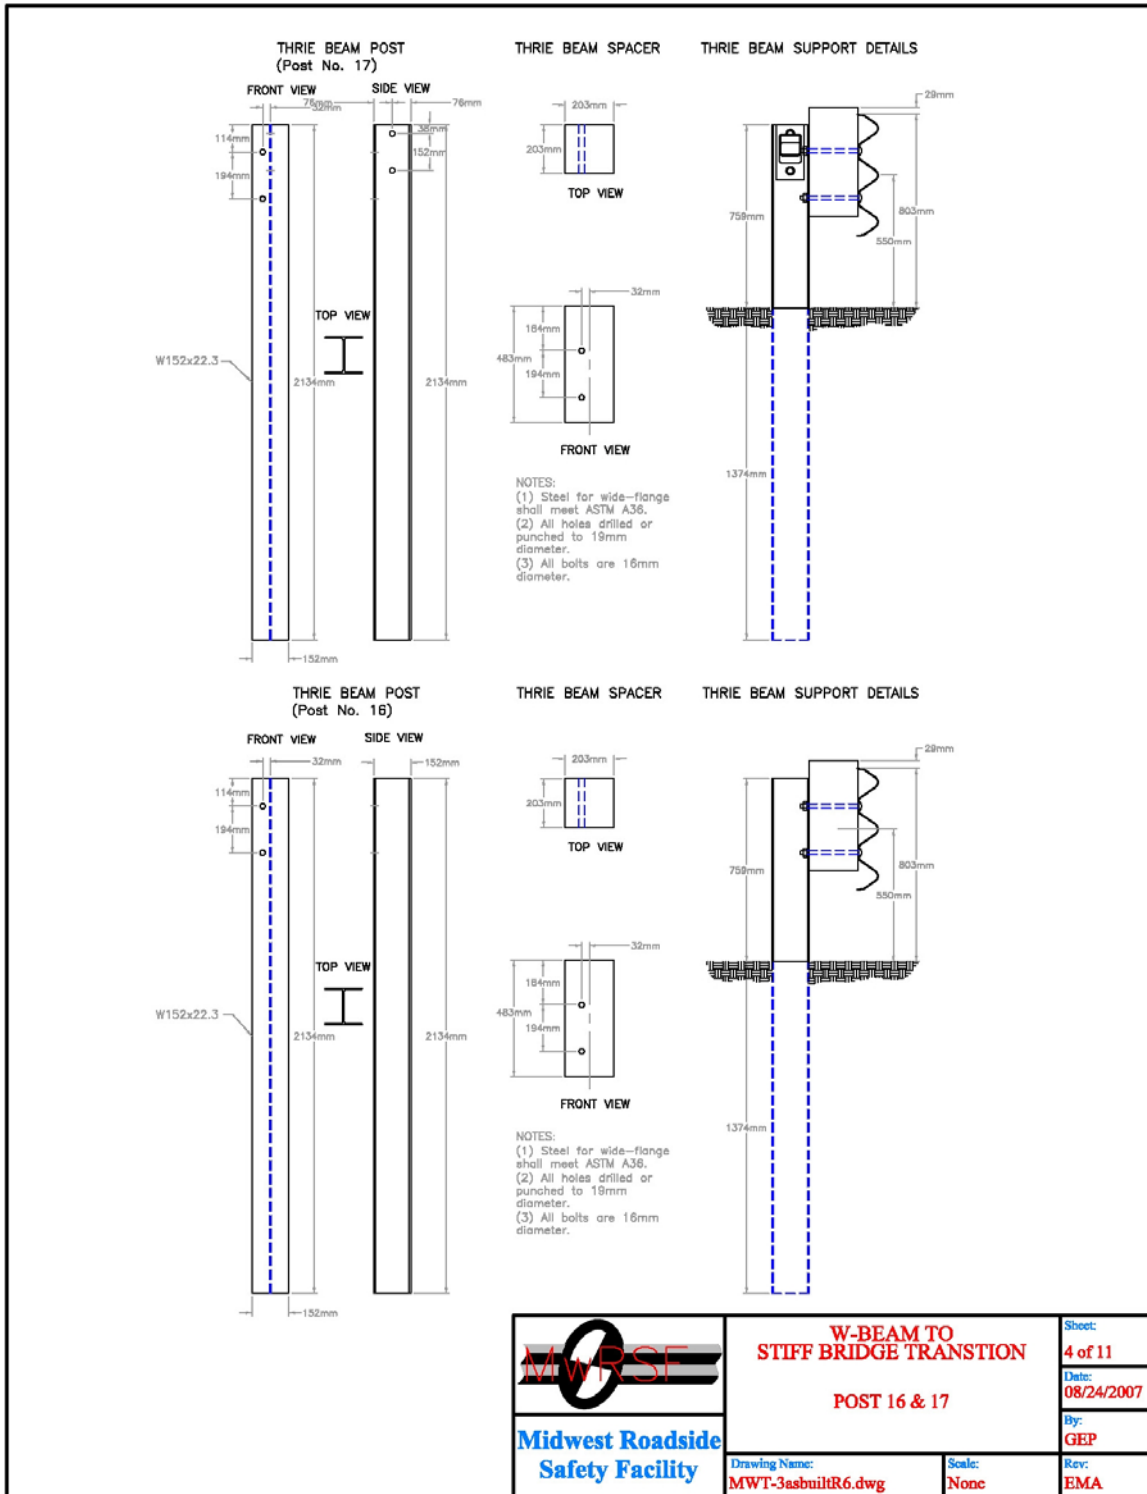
Post Nos. 16 and 17 Details (Design No. 1)
